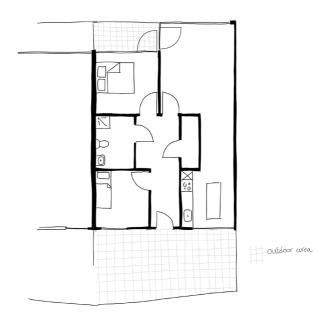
Schematic floorplan of Ms Bakers new apartment
